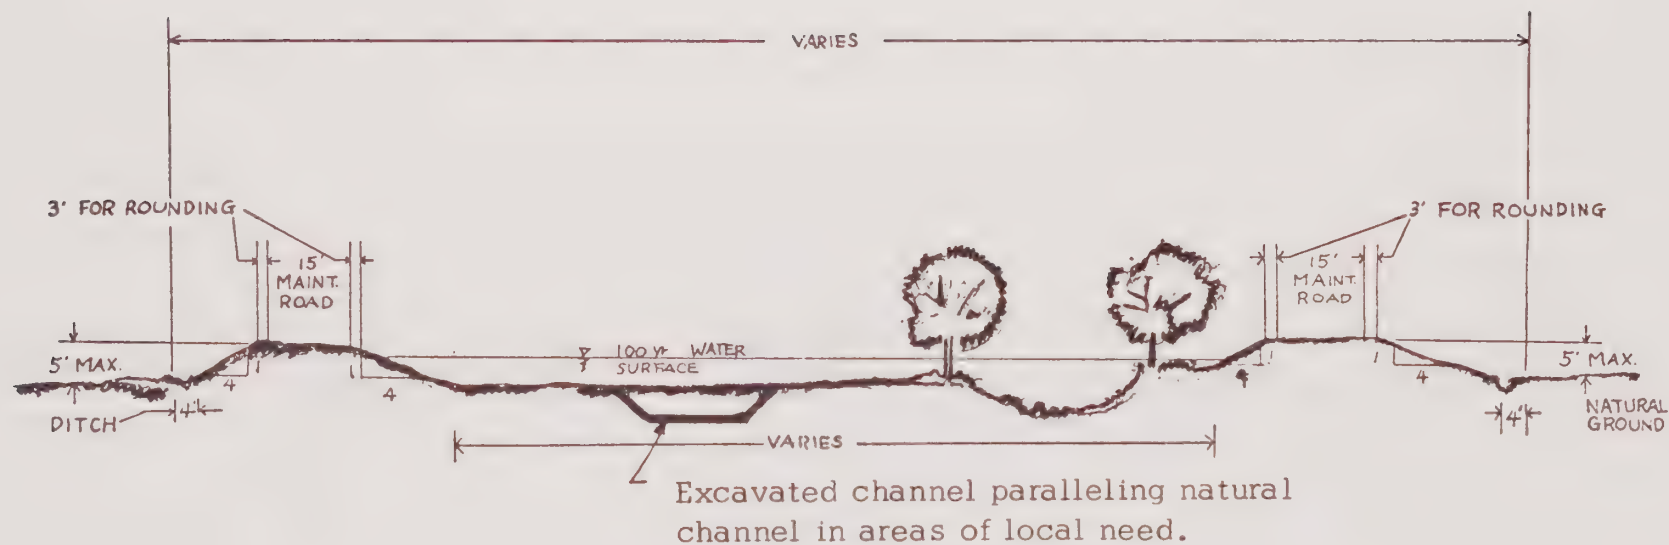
TYPICAL SECTION FOR MODIFIED FLOOD PLAIN
